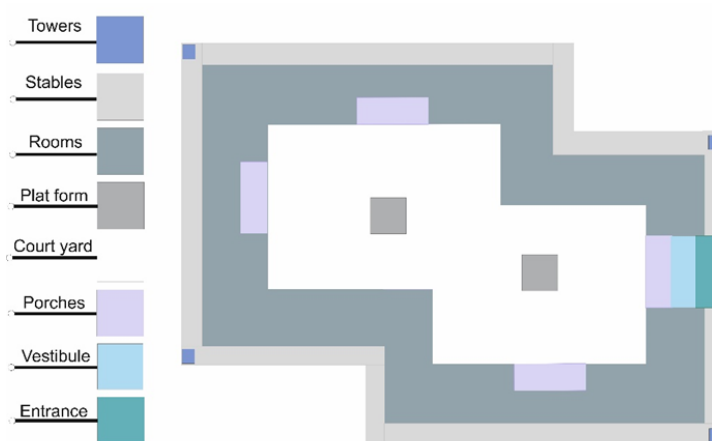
Caravansaries with irregular Plan. Schema (Author, 2019)
